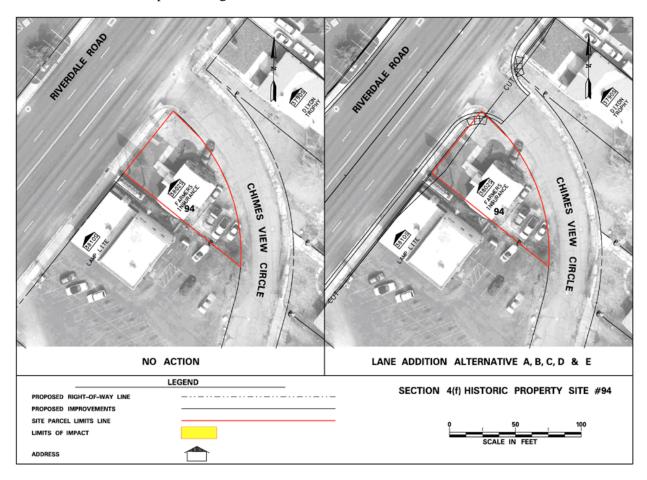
Site Plan 94 - No-Action and Lane Addition Alternatives A, B, C, D, and E.
